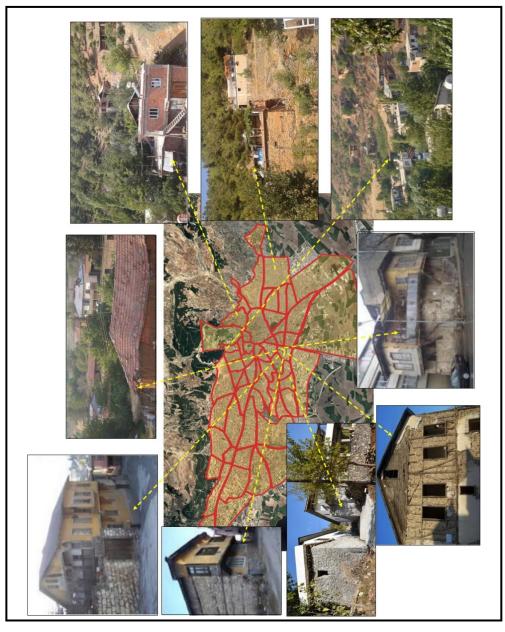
Masonry Structures Examples from City Center and Surroundings
